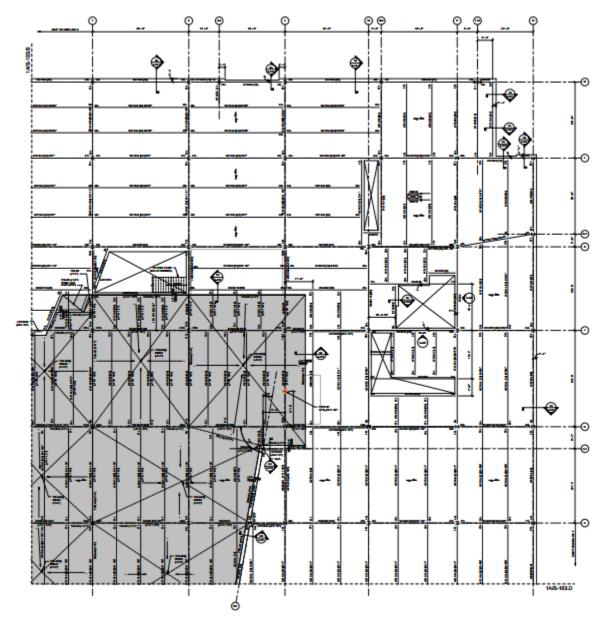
TYPICAL SEGMENT C FLOOR FRAMING PLAN
